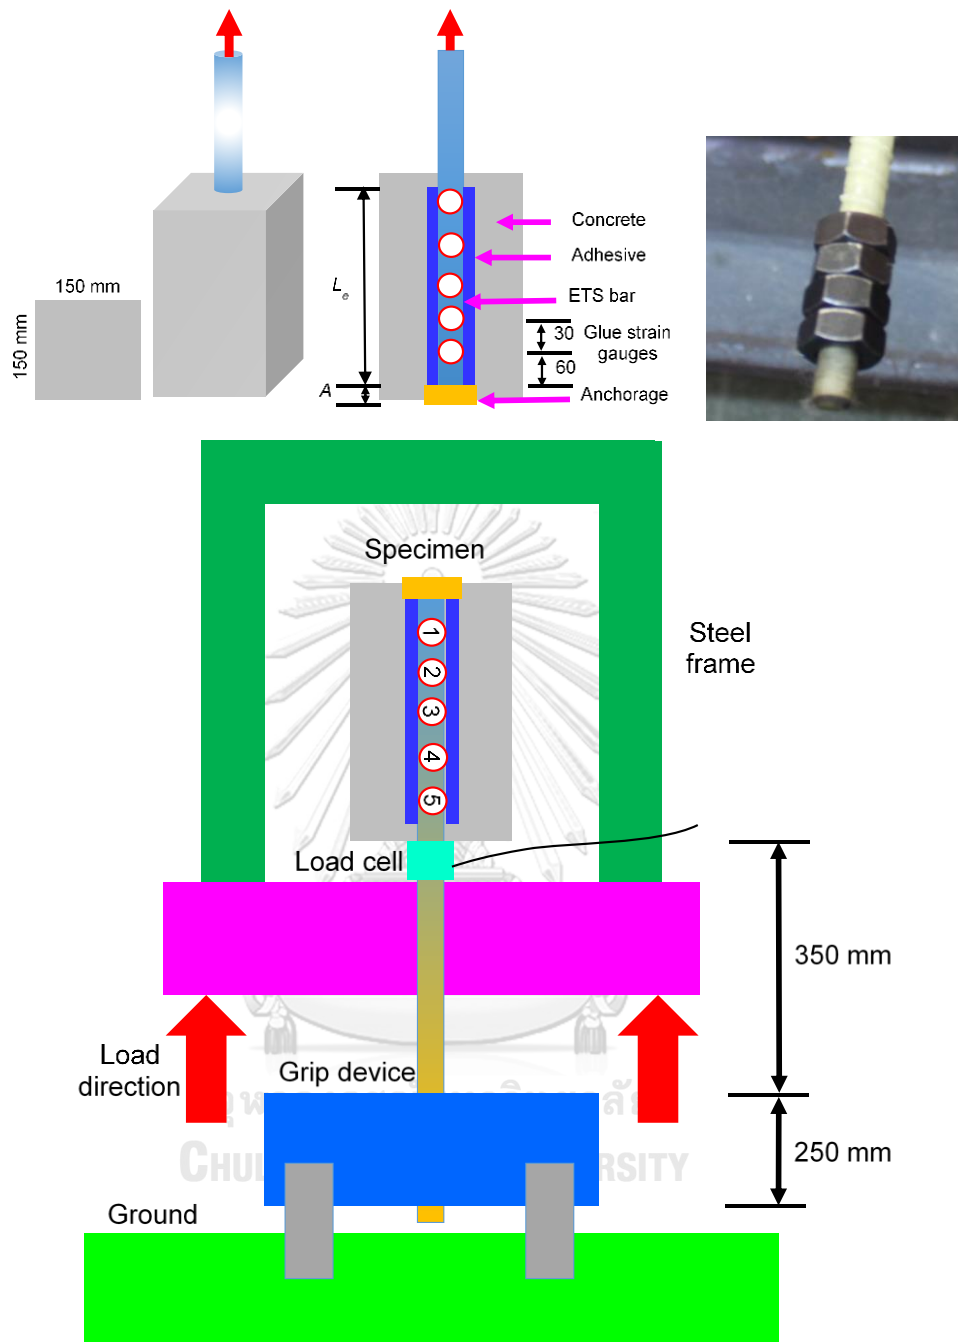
Configuration of the tested specimens, the anchorage device (anchoring nuts) at end of GFRP bar and the pullout test setup
